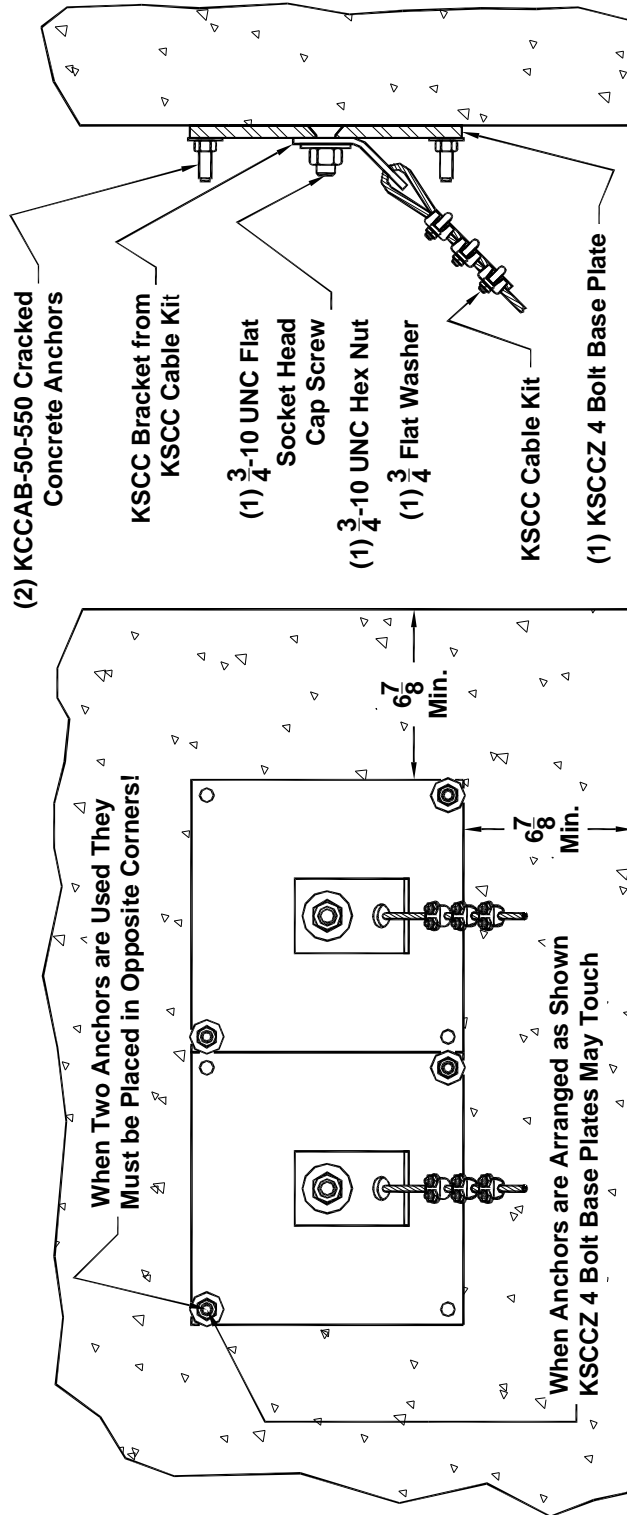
; Model KSCCZ2 Attachment Kit to Concrete Using the KSCC Brackets – (2) 1/2" Anchors
